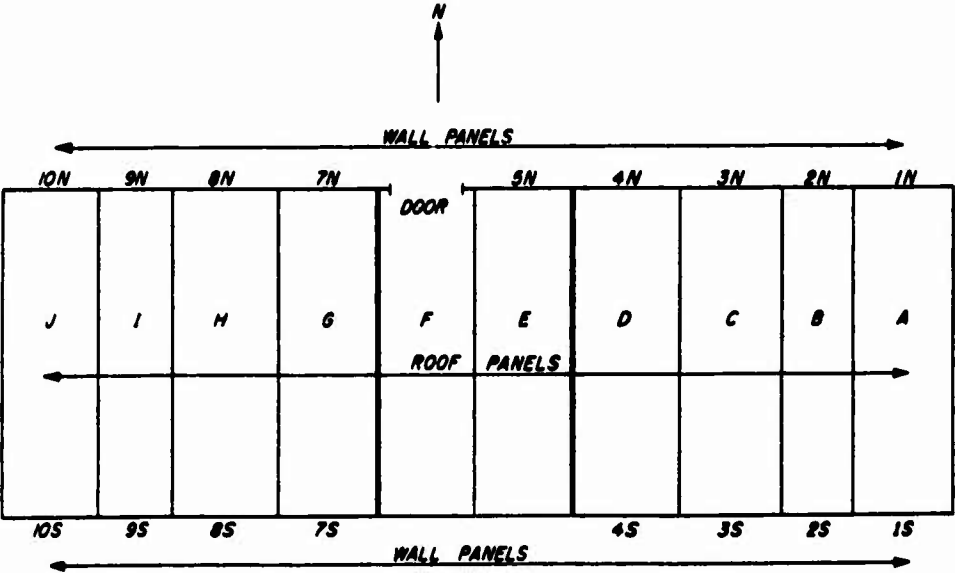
Positions of original numbered wall and roof panels in sandwich experimental unit. M 126 174
